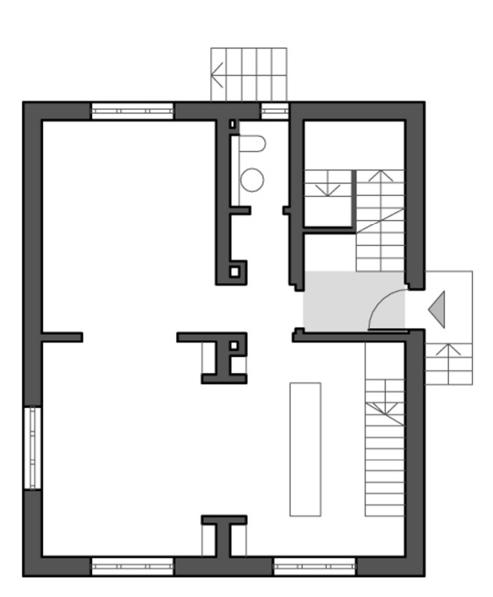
Inner hall, the entry-lock zone. Ground floor plan, scale 1:300, private house, Bochum, Germany, © [DETAIL]. Reproduced by permission of DETAIL. 38x44mm (300 x 300 DPI)
